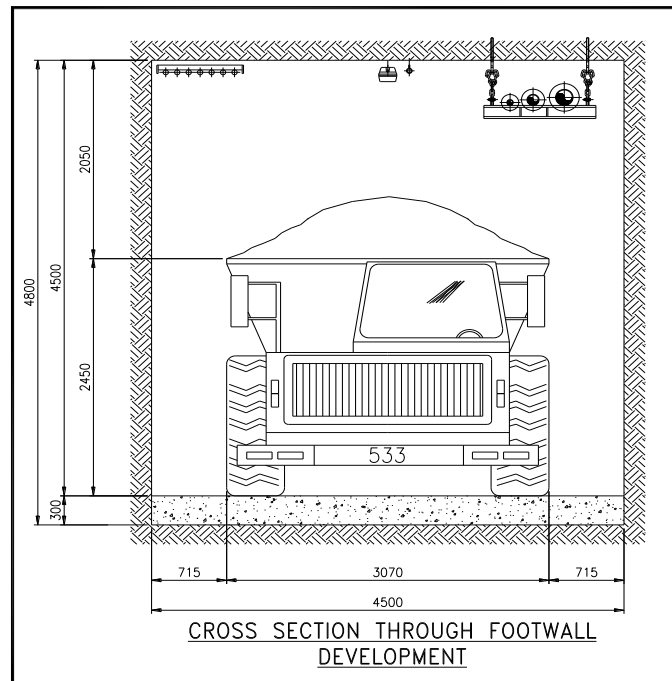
CROSS SECTION THROUGH FOOTWALL DEVELOPMENT
